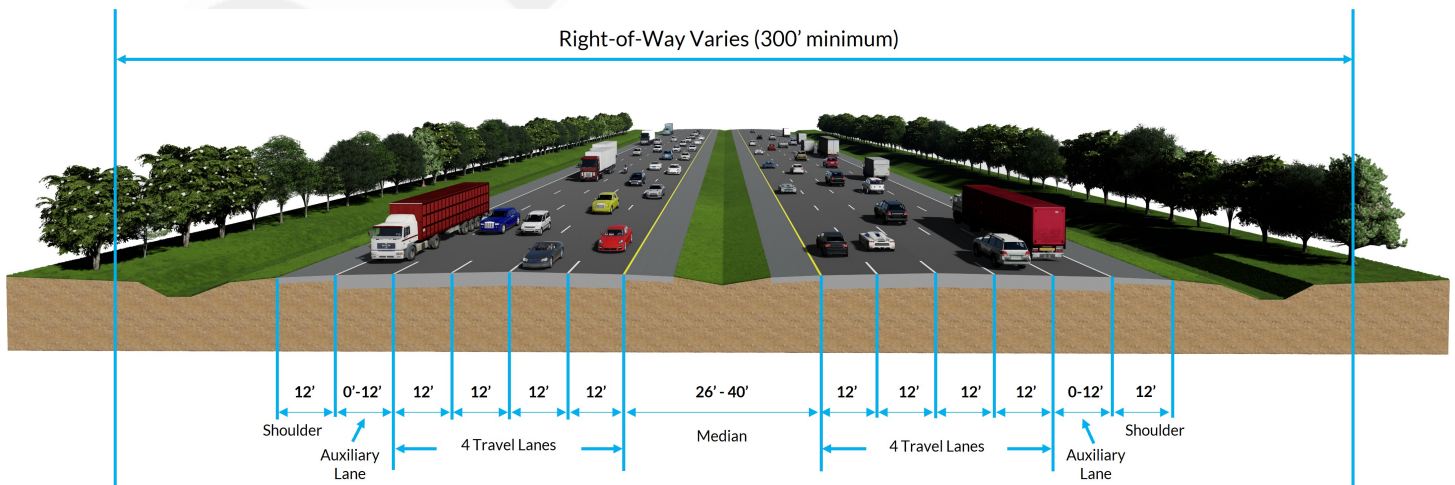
I-95 from Southside Boulevard to J. Turner Butler Boulevard (SR 202)
